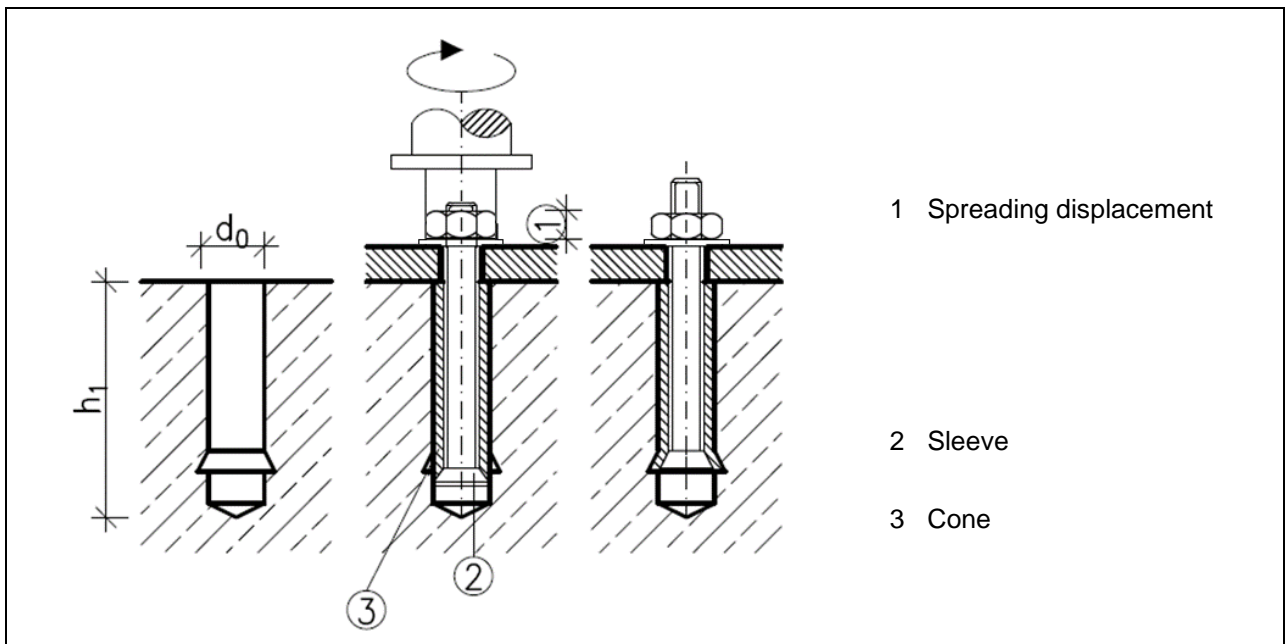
Fastener installation by pulling the cone with a defined expansion displacement into the fastener sleeve by turning the nut (achieved by a special installation tool)
